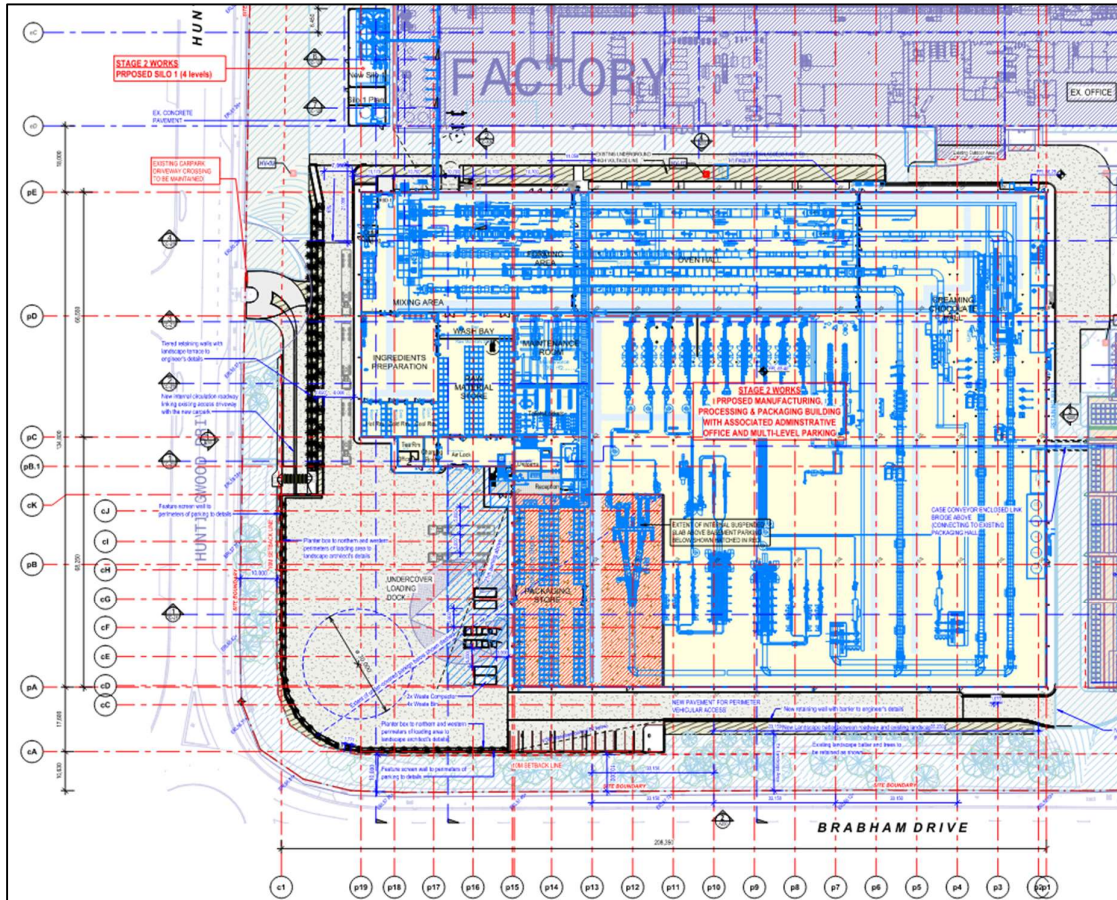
Northwestern End of Arnott' Huntingwood Site Showing Stage 2 Works
